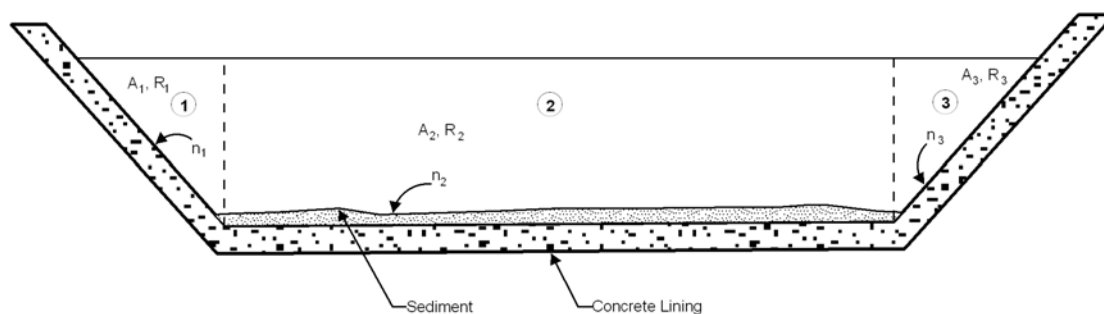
Schematic of a concrete-lined channel with significant sediment load.
